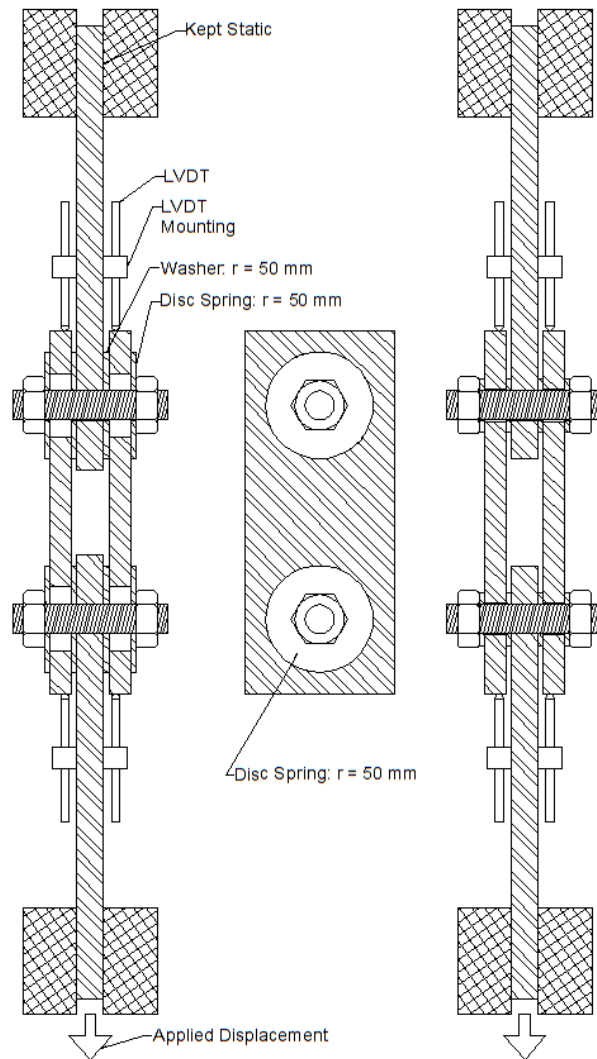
Left) Specimen with large washers and disc springs; Middle) Side view of this specimen; Right) Regular specimen
